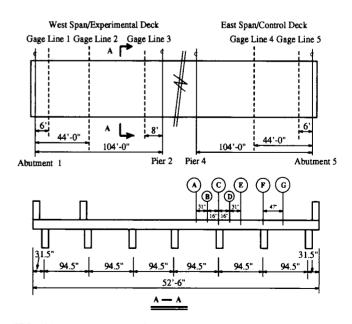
Locations of strain gauges in the bridge deck (1 in. = 25.4 mm).
